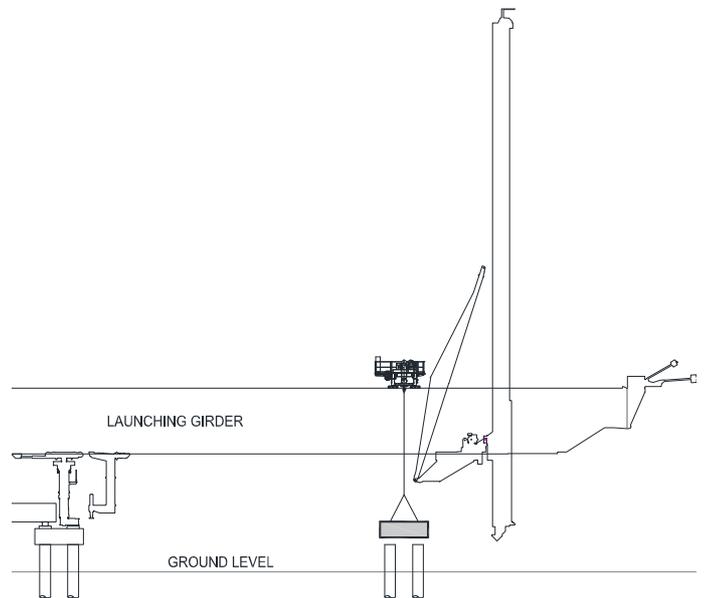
Launching of the precast elements over piles / Varo degli elementi prefabbricati al di sopra dei pali
